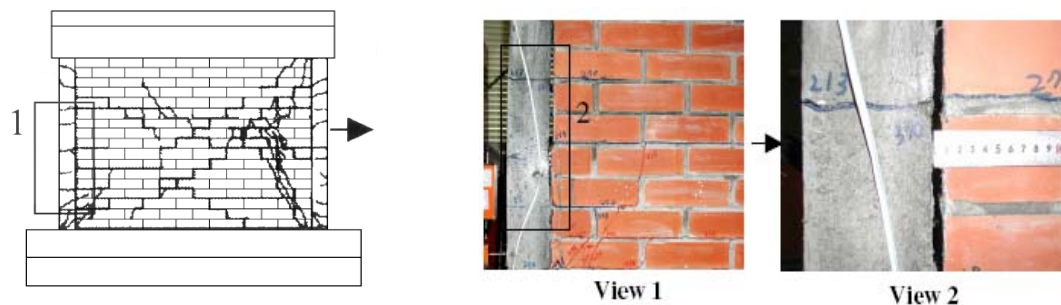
Flexural failure of confined masonry walls (Yoshimura et al., 2004).
